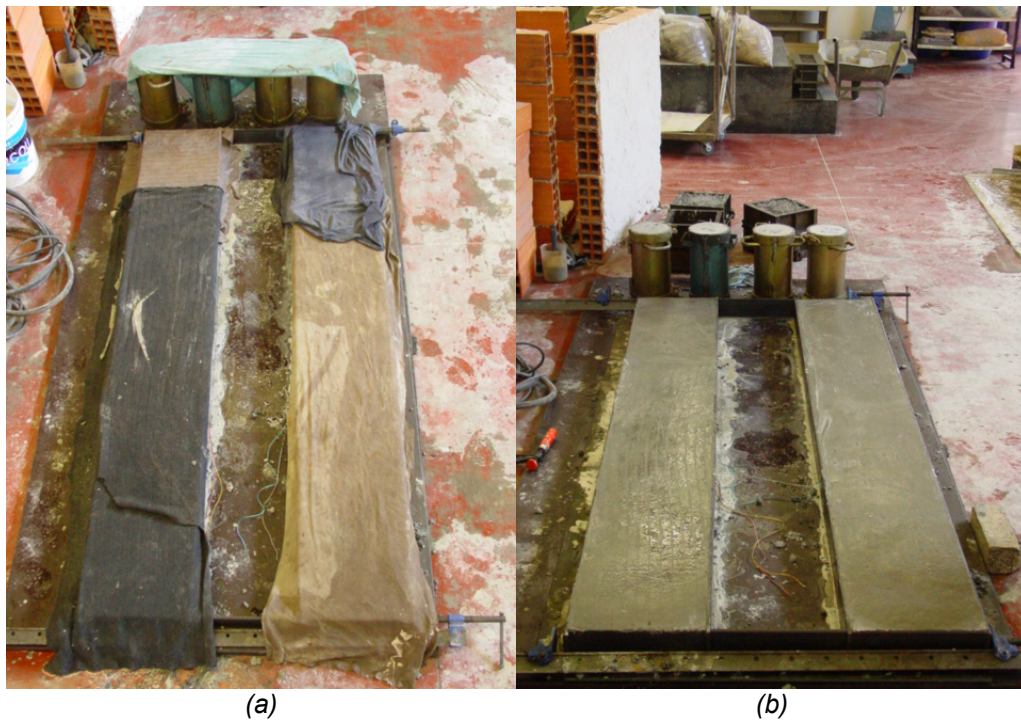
Slab strips, cylinders and beam specimens: (a) formwork set up and moulds used, and (b) plain concrete consolidation.
